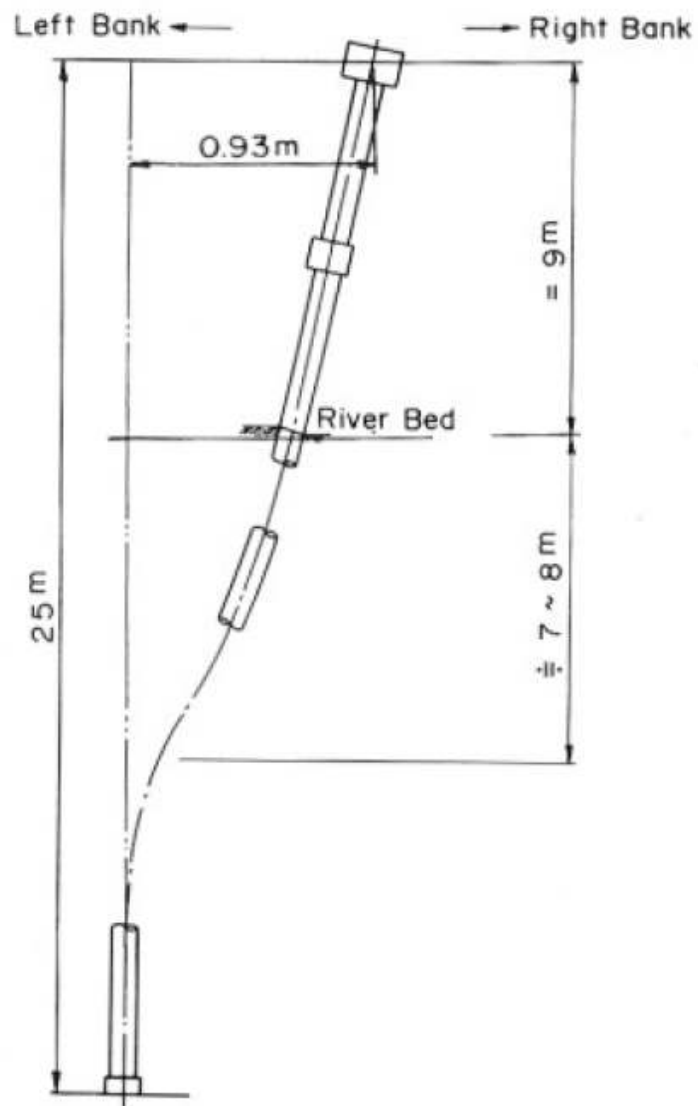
Damage to Steel Pipe Piles of Pier P4 of Showa Bridge (Hamada et. al, 1986)
